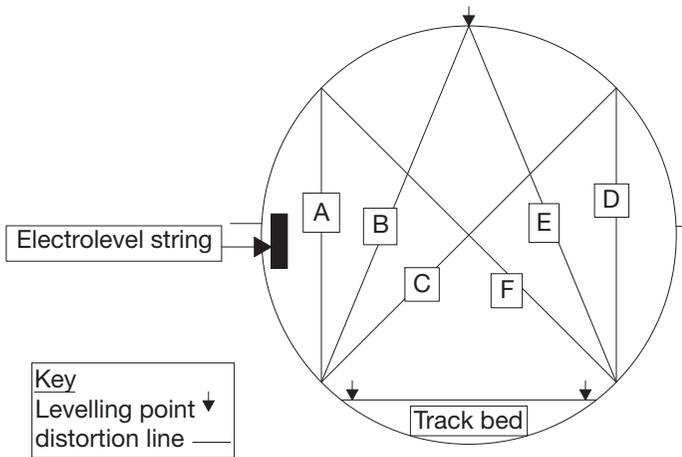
Example of monitoring within an existing tunnel in order to assess the effects of adjacent construction activities (after Cooper 2002)
